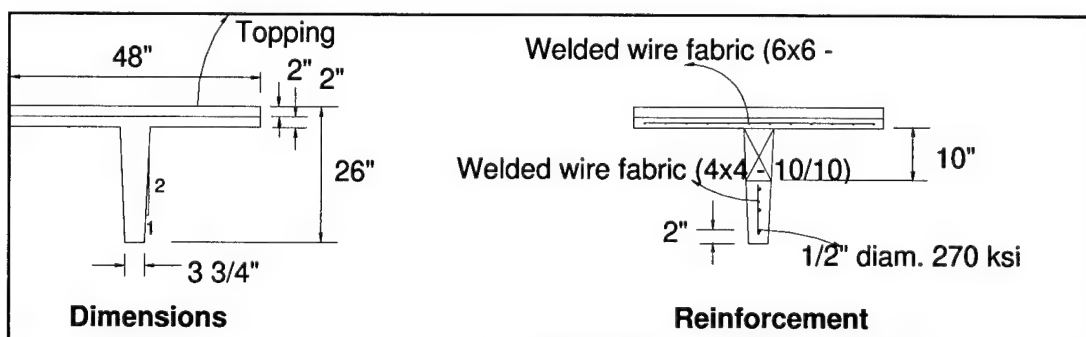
Long-span test beam sections from Barney et al. (1977).
